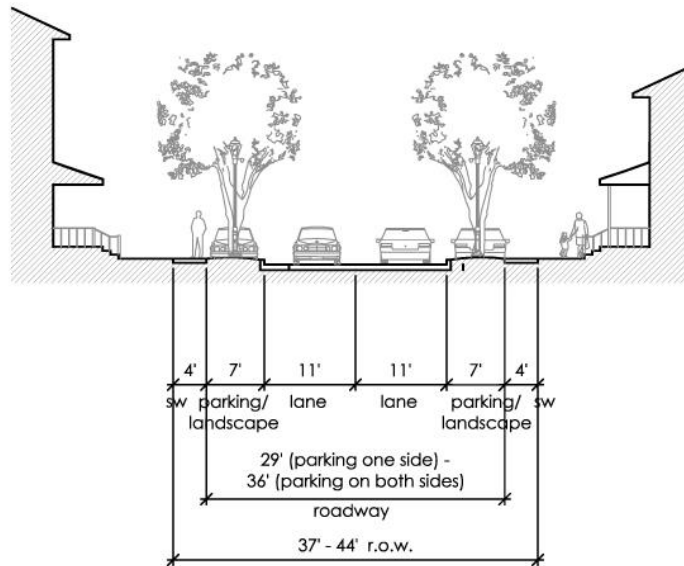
Typical Local Street (Parking on One or Both Sides)
